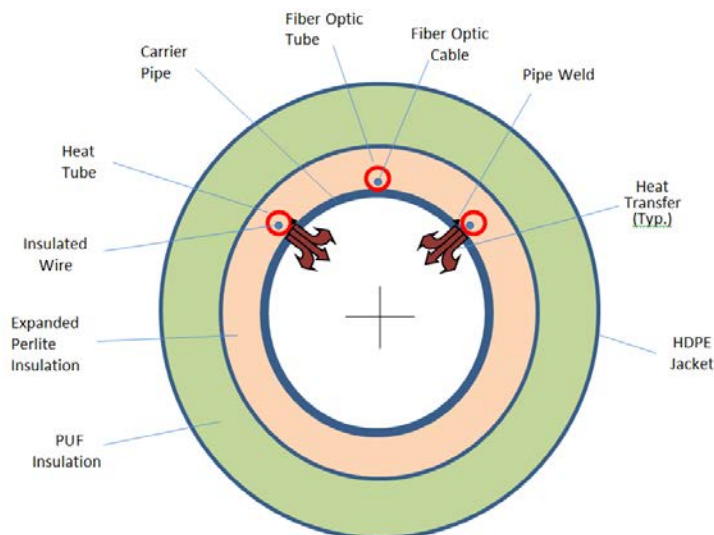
Cross Section for Multi-Tube Welded System
